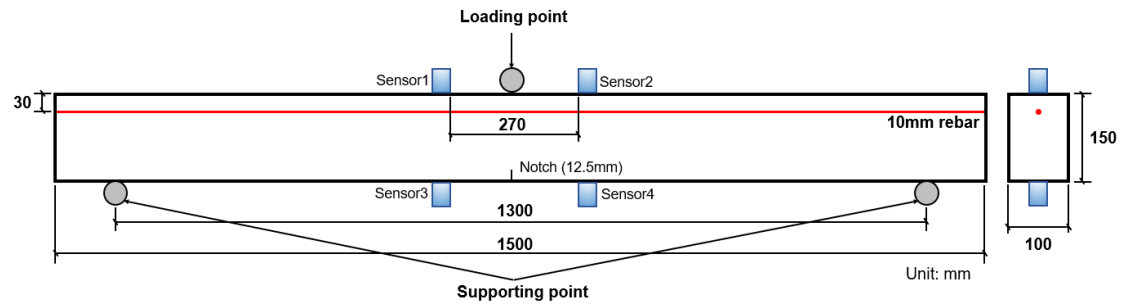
Specimen setup and dimensions for 3-point bending test
